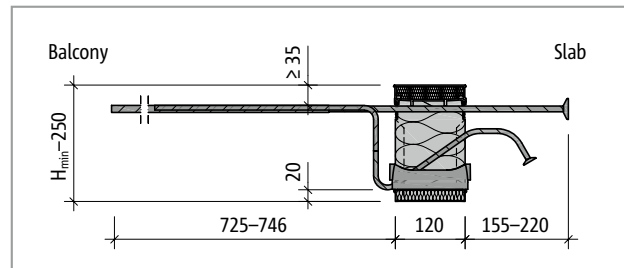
Schöck Isokorb® XT type K-U: Product section
